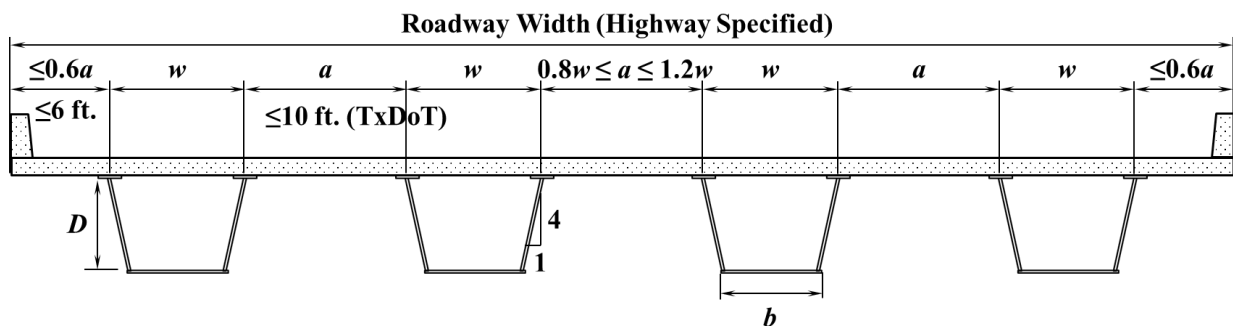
Typical Cross Section of Tub Girder Bridge
